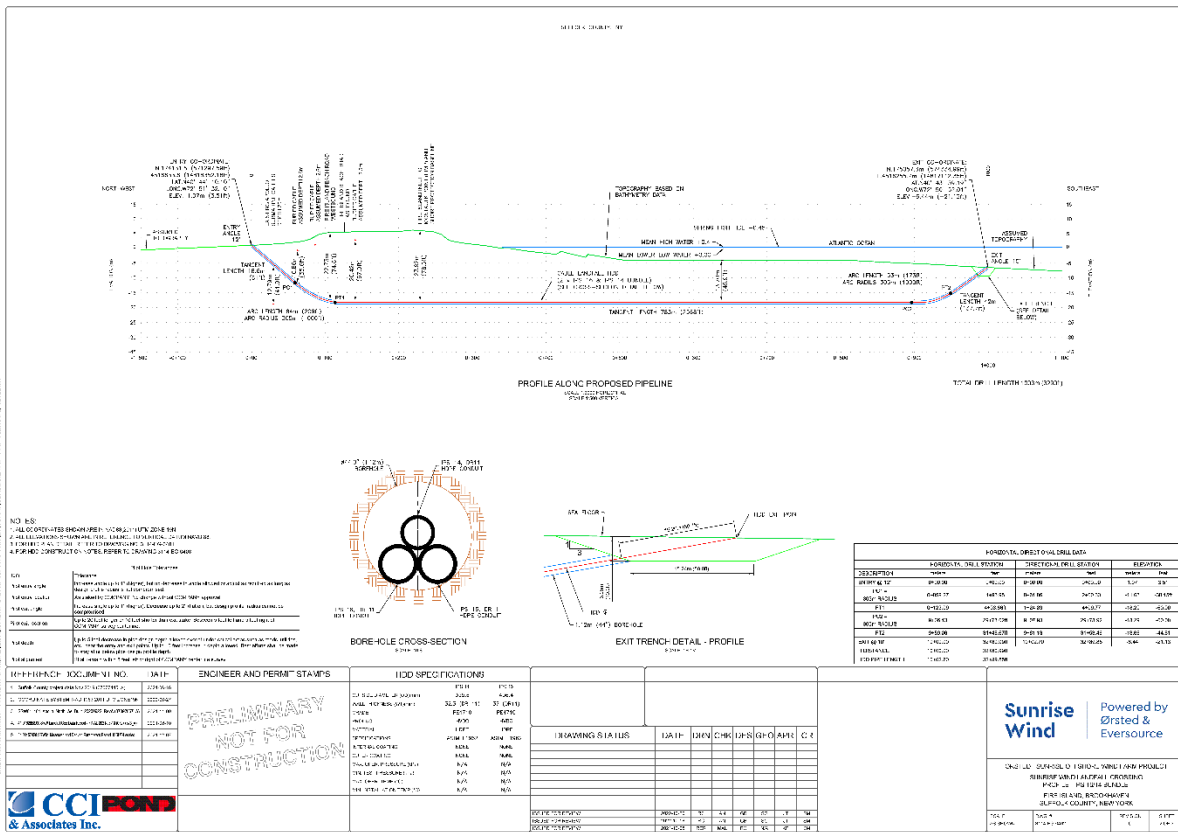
Preliminary Plans for Landfall HDD Exit Pit
